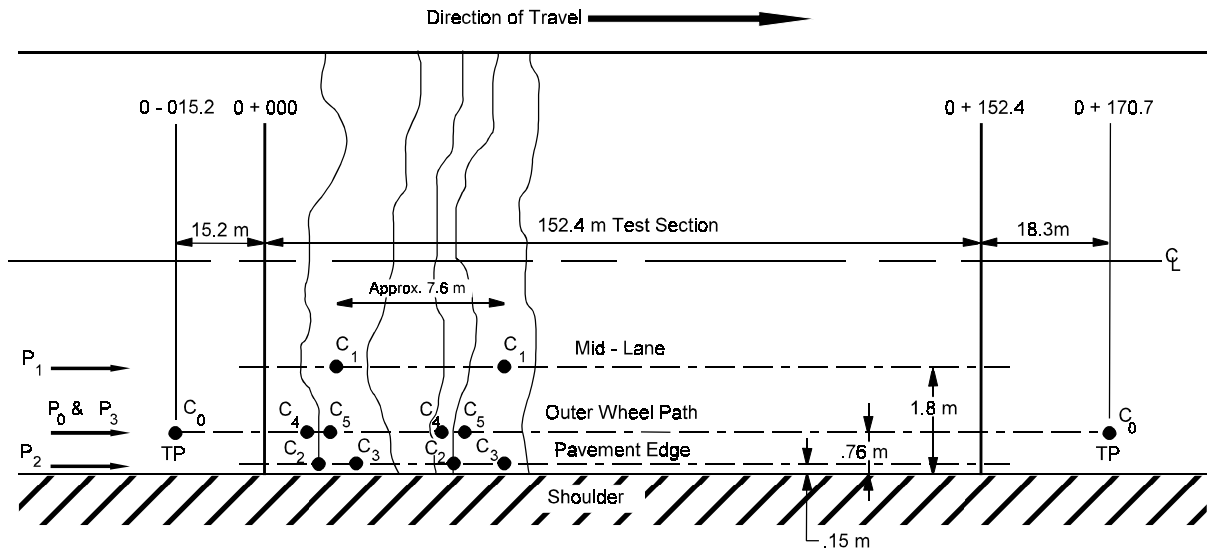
and Table A-1 summarize the CRCP FWD test plan for GPS Experiment 5. This plan is like the JCP plan *with the major exception for the location of the load plate for Test Point ID No. C2*. For the JCP plan, test point No. J2 is a *corner* load condition. However, for the CRCP plan, test point No. C2 has the load plate *centered* on the transverse crack defining the beginning of the effective panel being tested during the PE pass.
